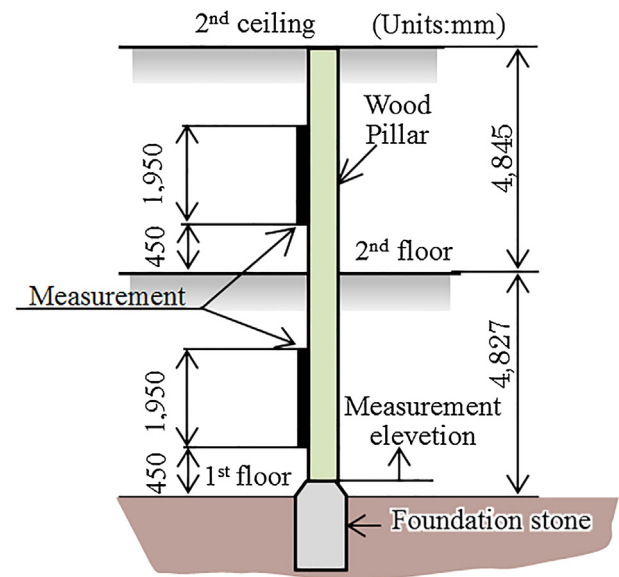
Measurement section for the pillar inclinations and the elevation of foundation stones.
